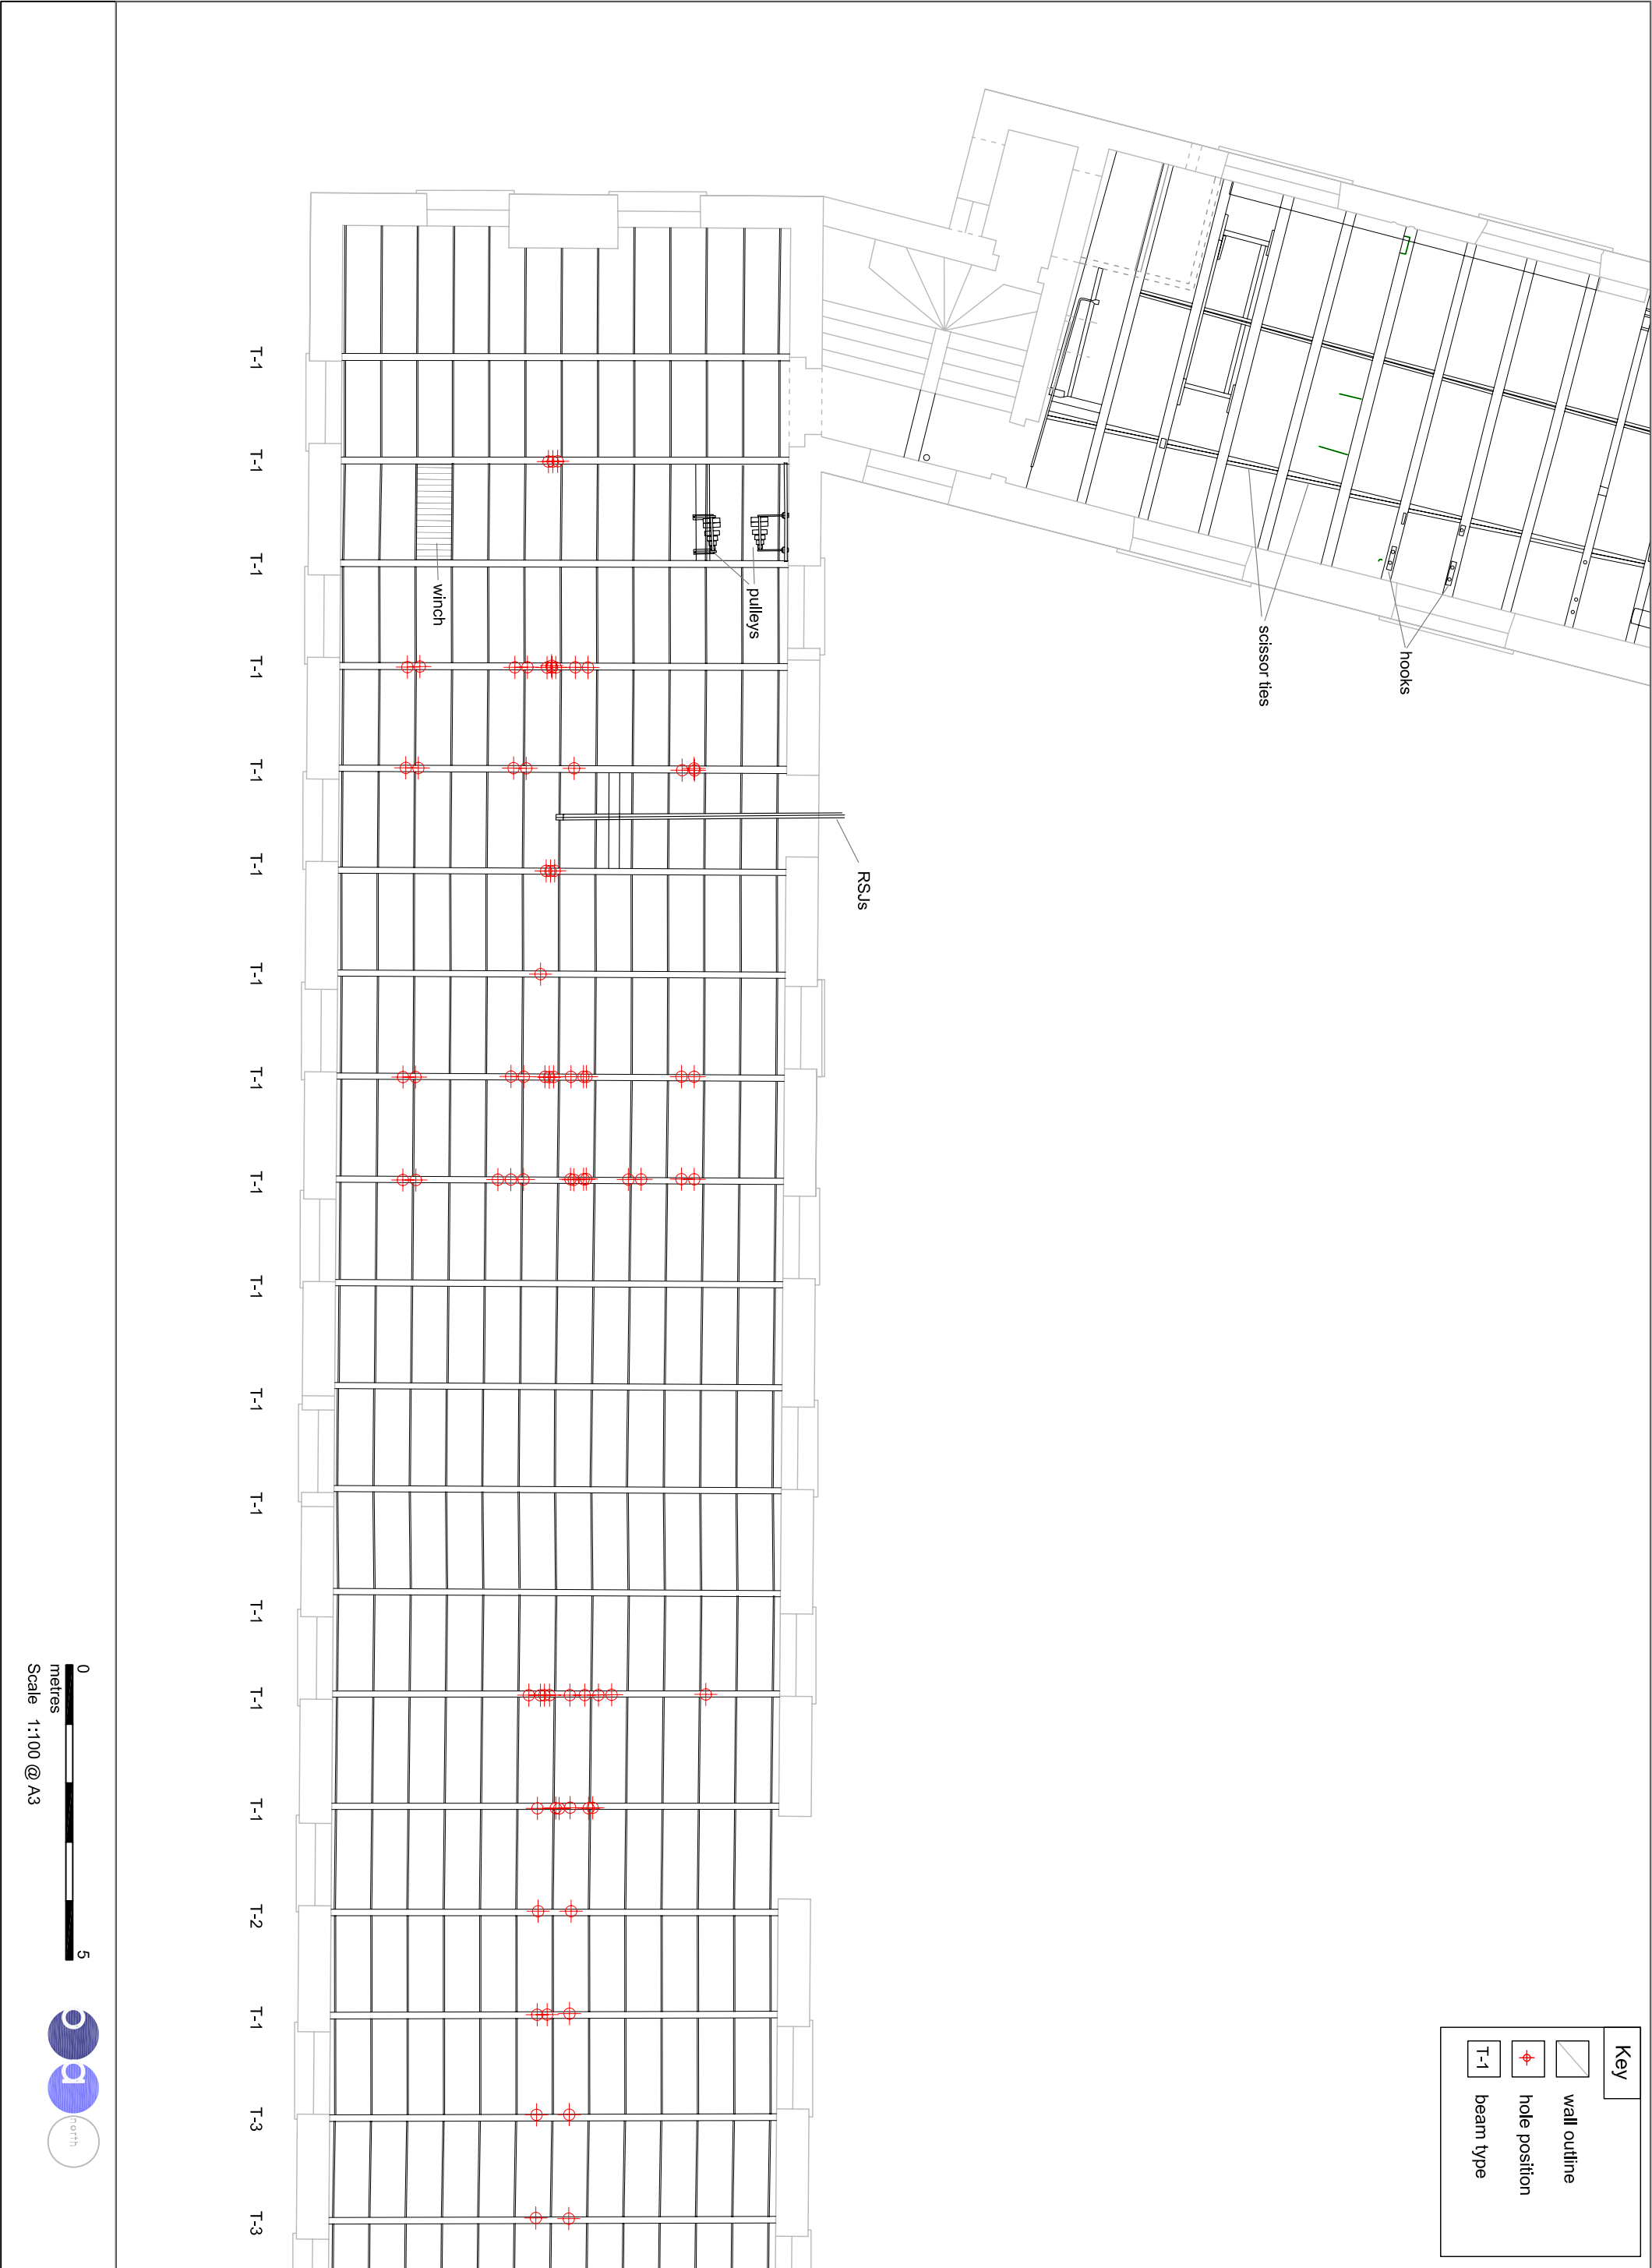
Second floor, reflected ceiling plan of Range A (west end)
